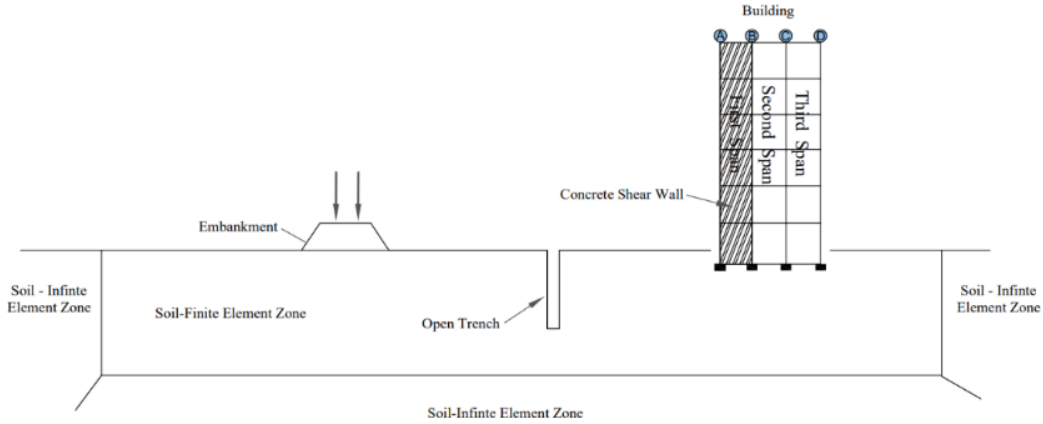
Schematic of the parametric model geometry and corresponding measurement locations considered in the shear wall placement study.
